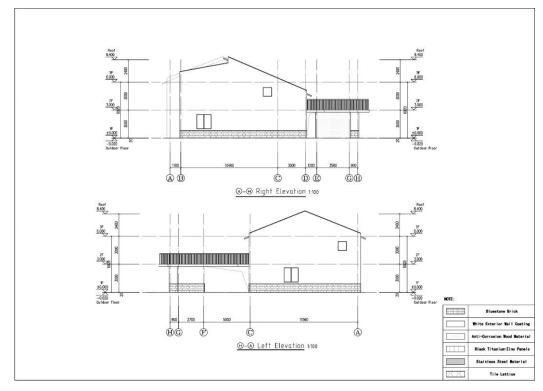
The Right Elevation and Left Elevation of Building Complex (Drawn by the author)
